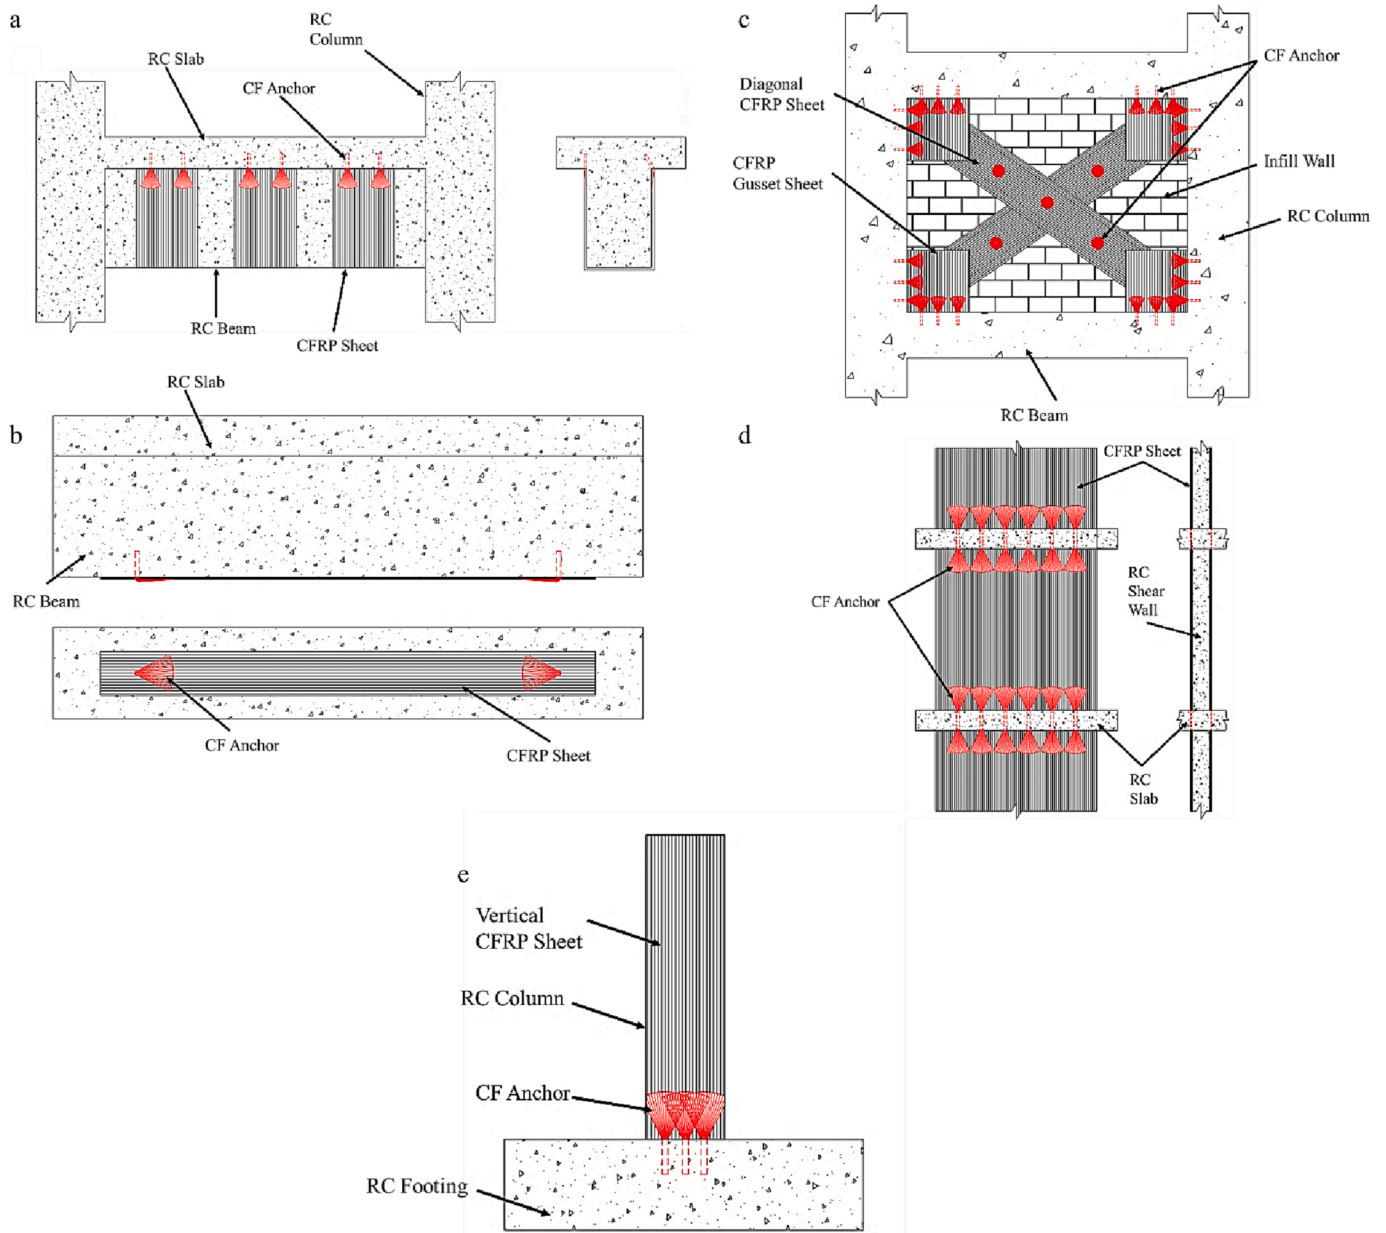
CF Anchor Applications a) Shear Strengthening of T beam b) Flexural Strengthening of Beam c) Integrating Infill Wall with RC Frame d) Flexural Strengthening of RC Wall e) Flexural Strengthening of RC Column.
